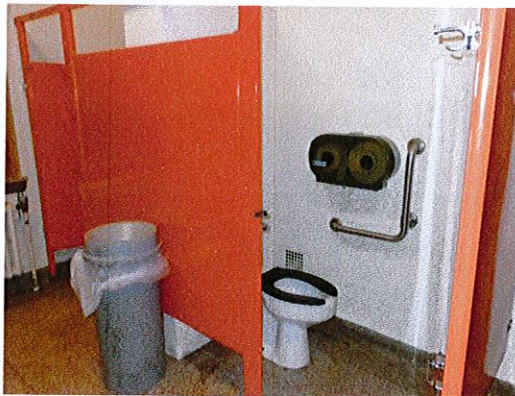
View of typical men's toilet room. Features of accessibility are not provided in the multi-fixture toilet rooms. Post signs directing to the unisex accessible toilet room.
